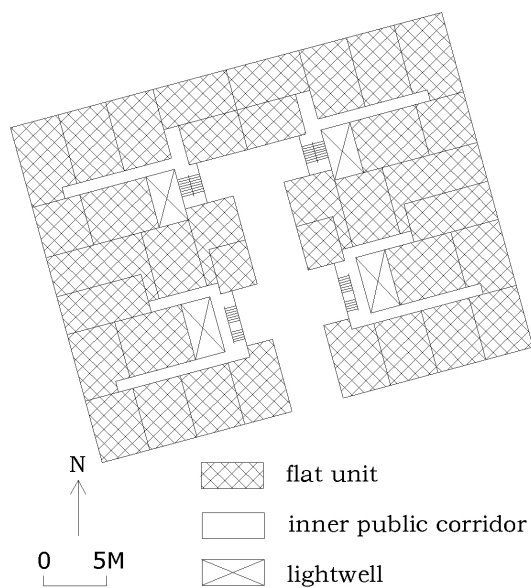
Floor plan of a typical multi-storey apartment building constructed in the 1980s.
